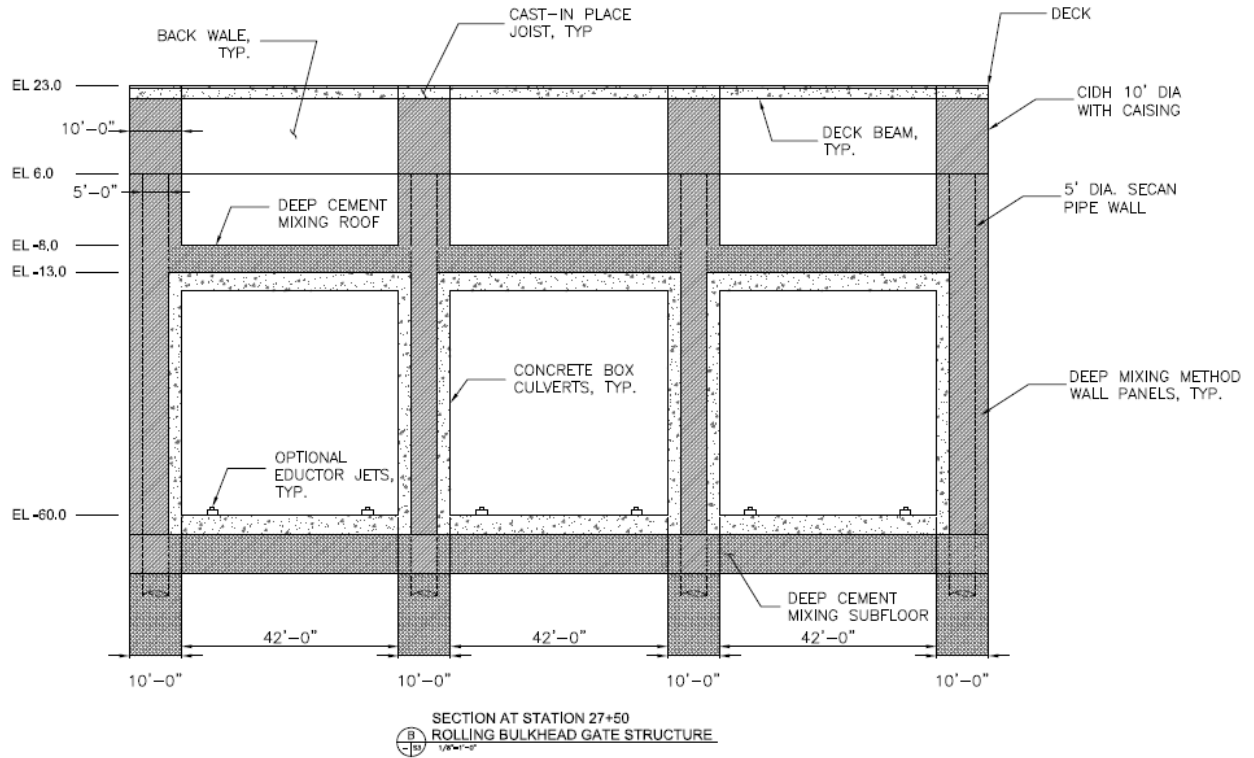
Alt. C – Cross-Sectional View of the Submerged Box Culverts, with a Cast-In-Place Concrete Liner (This Image Shows How Eductor Jets (Sand Pumps) Can Prevent the Submerged Box Culverts from Plugging with Sediment)
